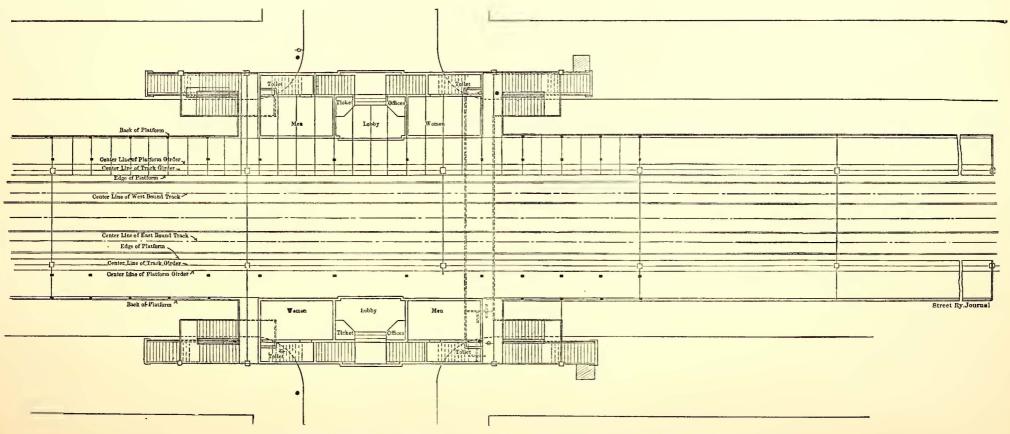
DETAILS OF ELEVATED STRUCTURE ON WEST MARKET STREET ELEVATED RAILWAY
